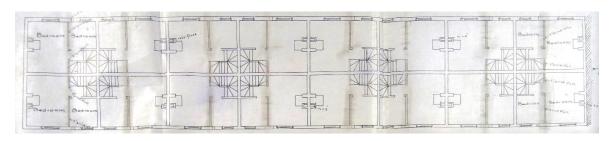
The first floor had two bedrooms (Carby Hall and Dalby 1903).
